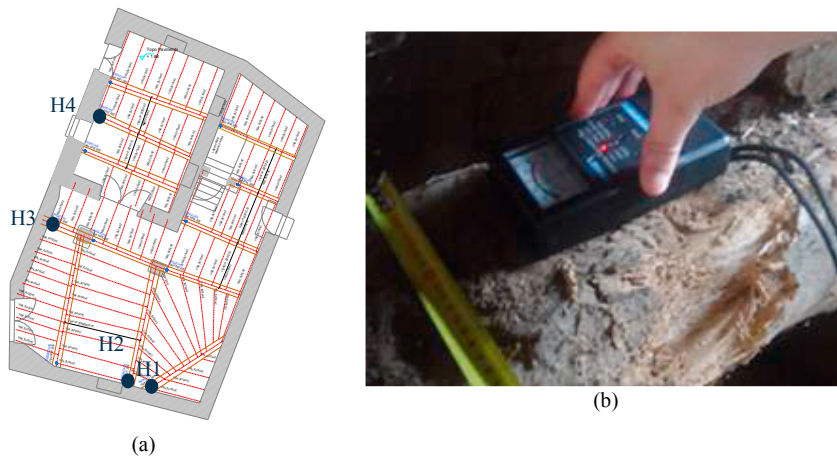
Structural plant of the ground floor with the identification of the inspection sites (images from: [9]).
